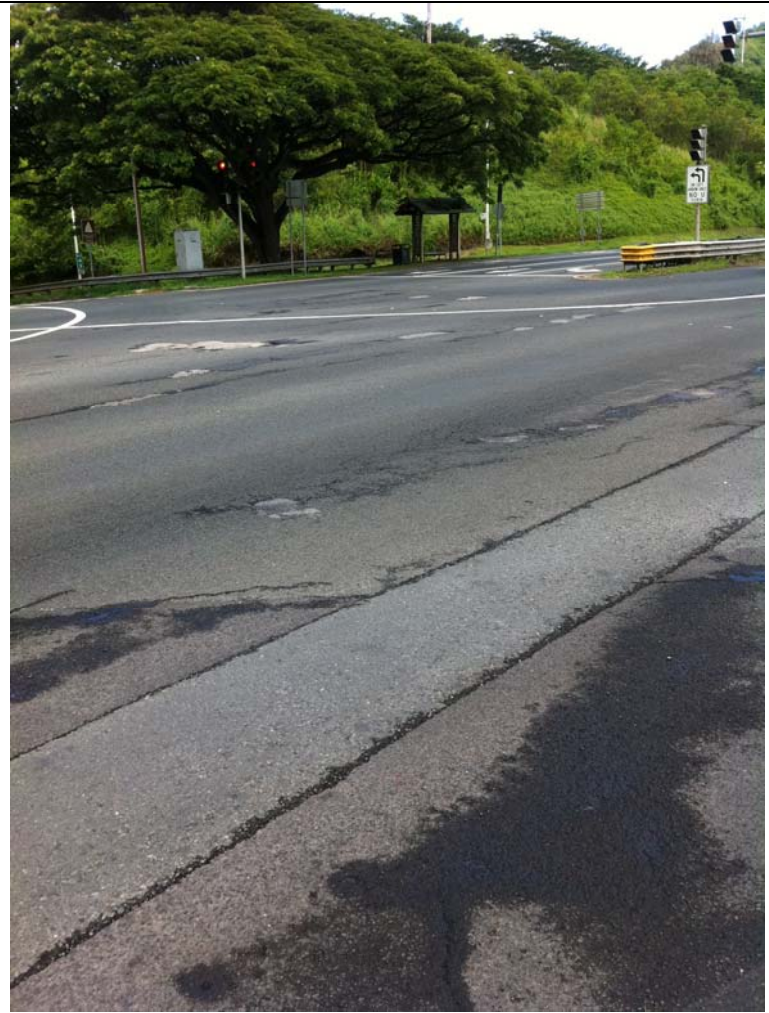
Severely distressed pavements with rutting, shoving, and cracking.
